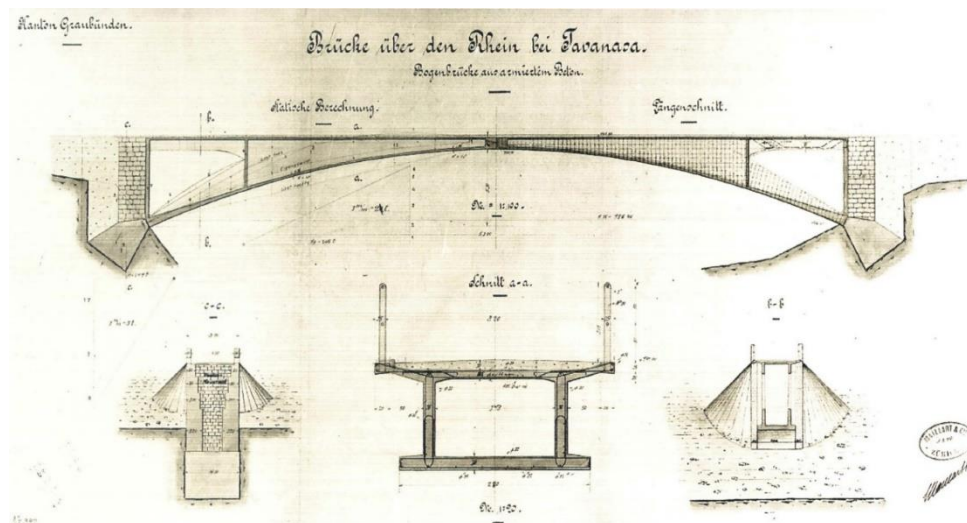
Tavanasa Bridge, Maillart (1905) three hinged arch (a)deck view\_ (b) Billington, Robert Maillart's Bridges (1989)
